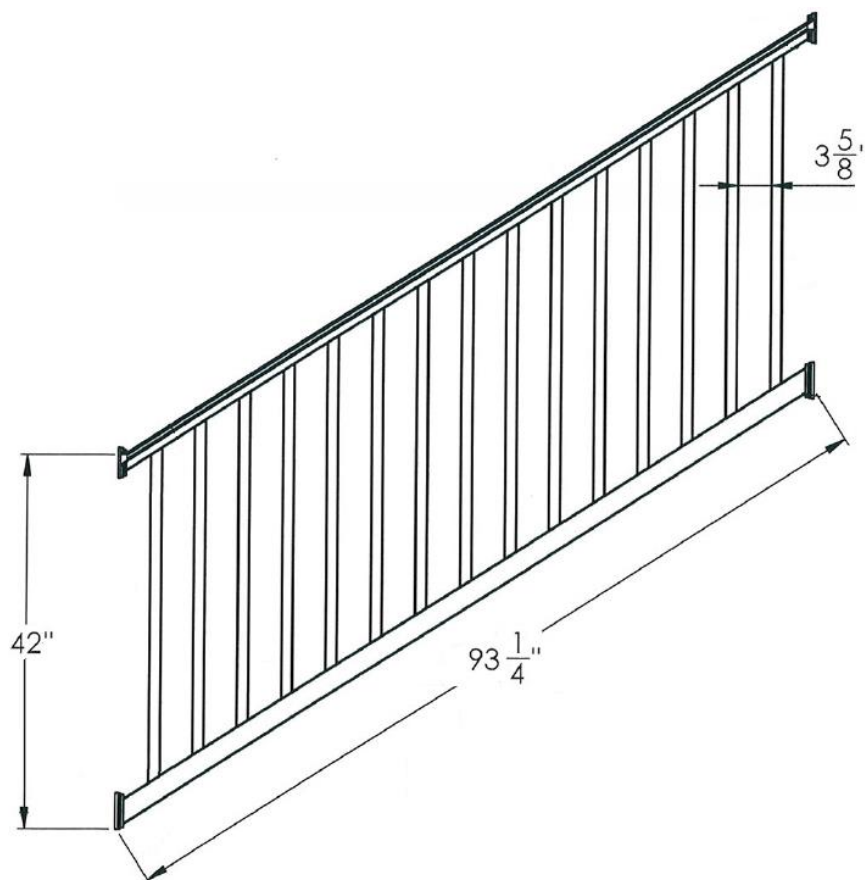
TYPICAL 8' x 42" QUANTUM RAIL STAIR RAIL KIT
